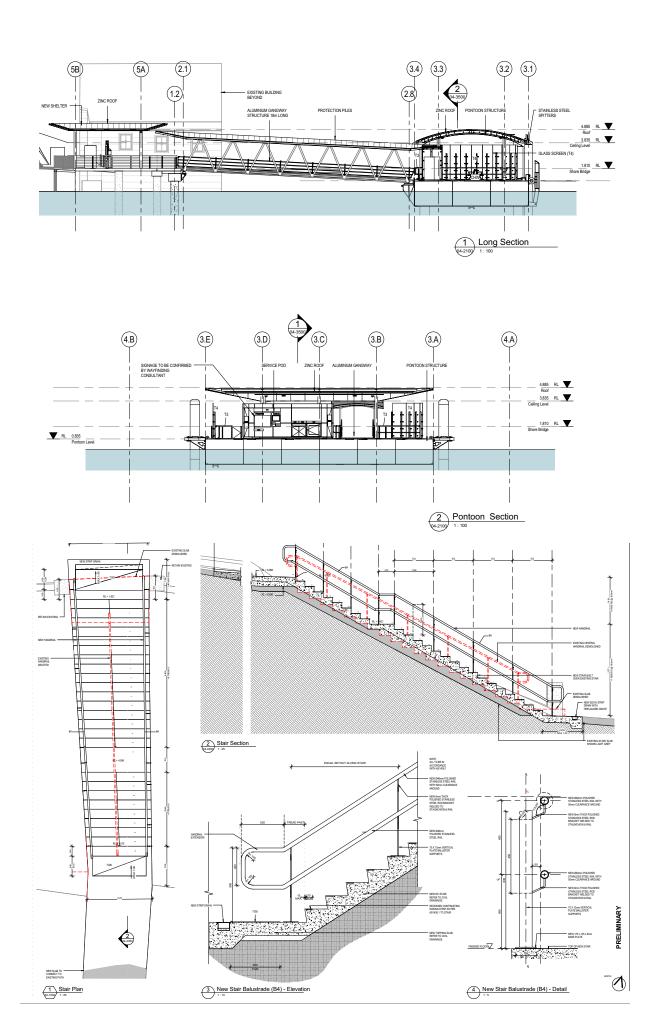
Architectural sections of proposed wharf structure and stair (courtesy of Conrad Gargett Ancher Mortlock Woolley)
